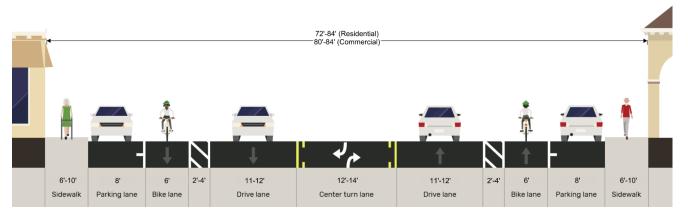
Proposed Typical Section for Secondary Arterial (Buffered Bike Lanes and Parking)
